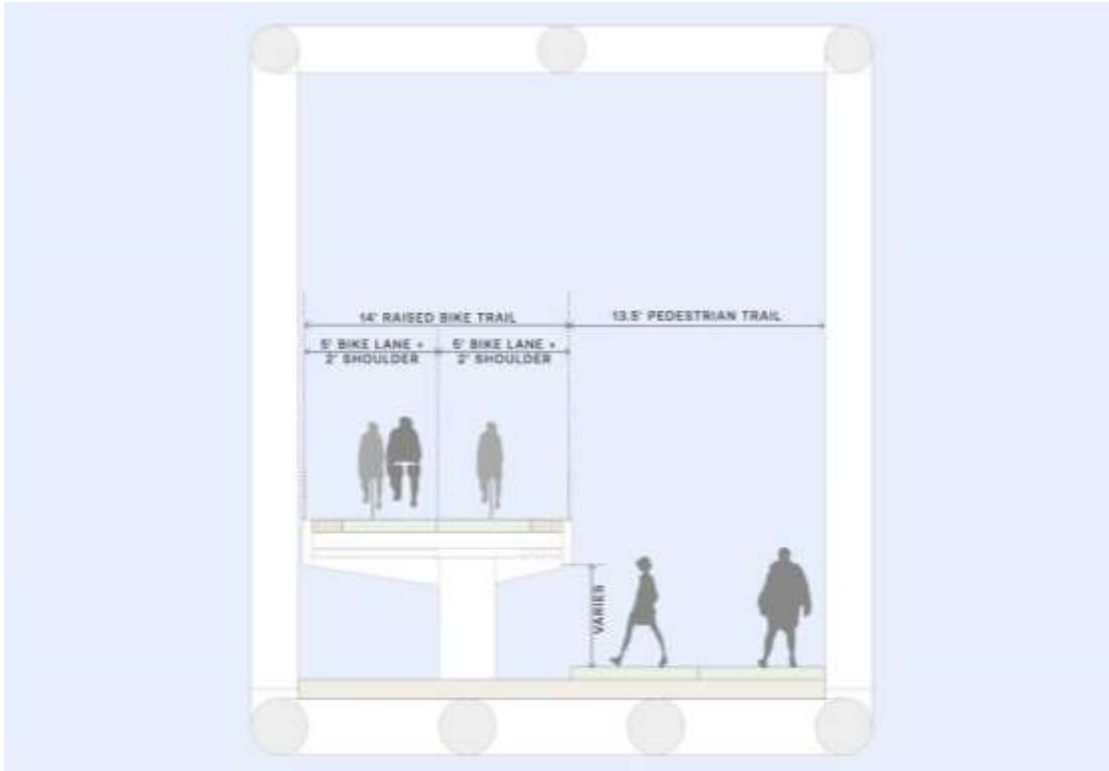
Section of the truss alternative over the I-405 span - bike path ramp.
